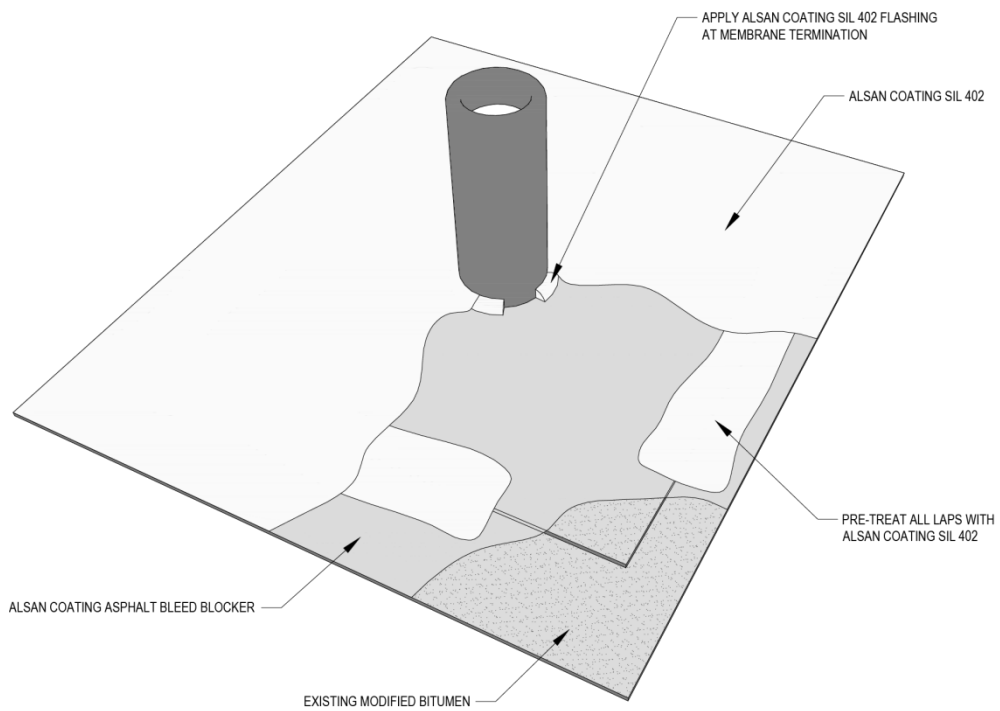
Silicone Roof Coating Over SBS Modified Bitumen, Penetration
